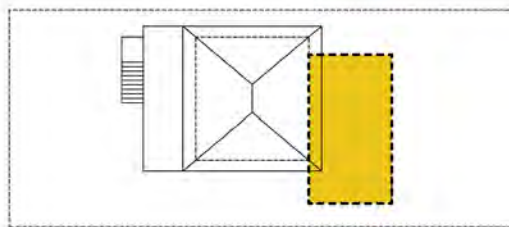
Addition to the rear of a building that is visible from the street should be consistent with the overall massing and form and not dominate the existing buildings and lower than the established ridge height
